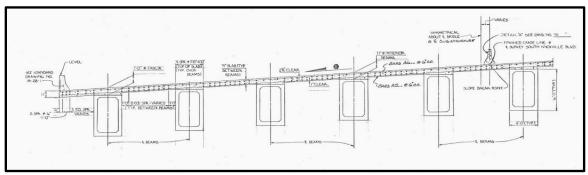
Concrete Approach Cross Half-Section, Current Configuration
